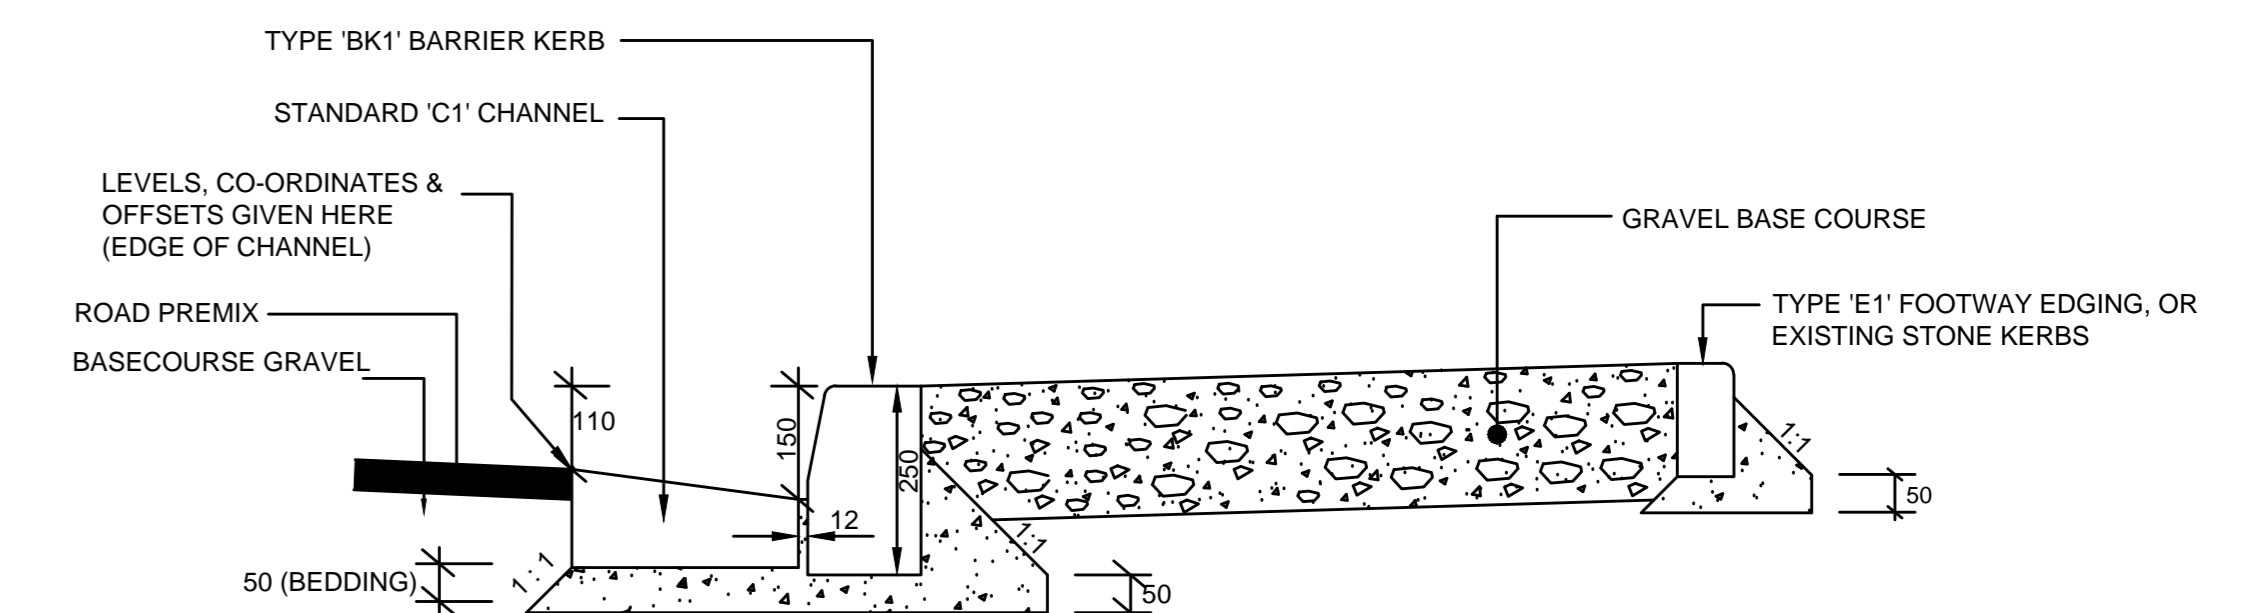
DETAIL FOR LAYING DISH CHANNEL (V-CHANNEL)
